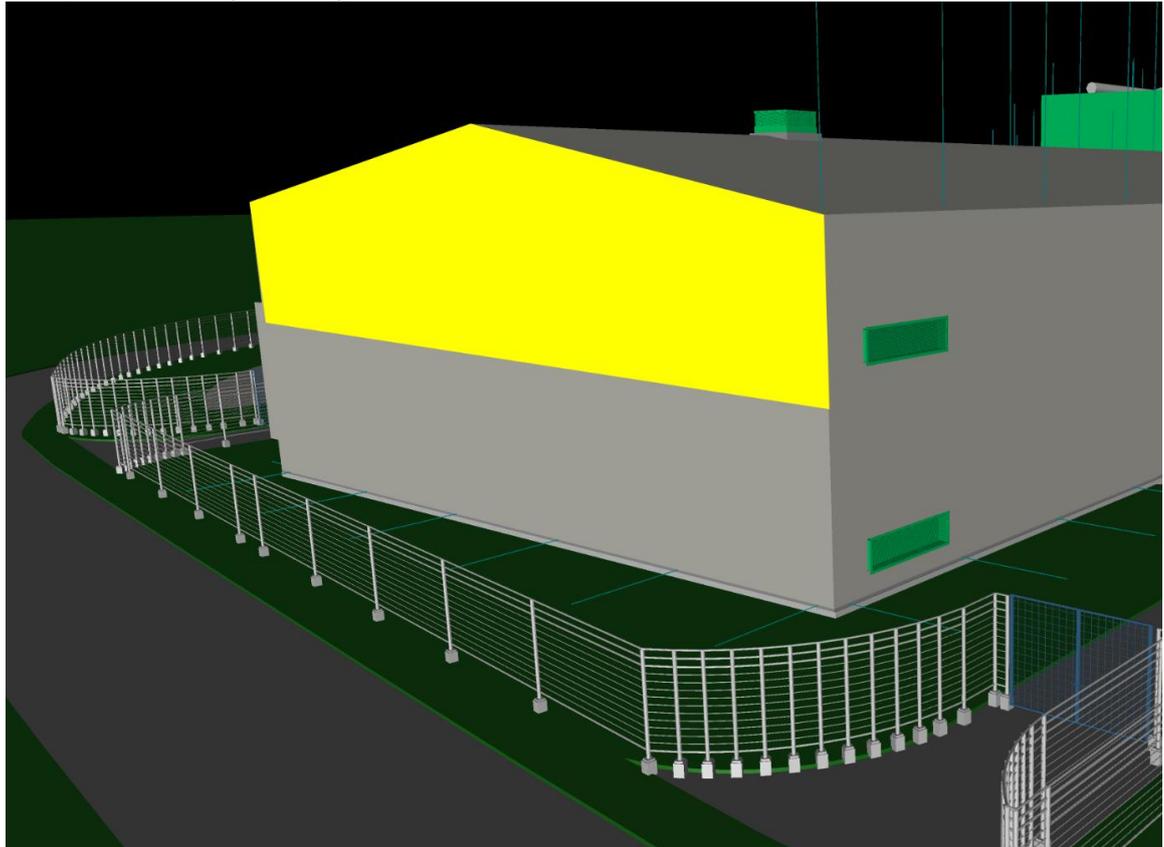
Fuel Handling and Bunker Building (UEA, UEB) West Elevation 1
